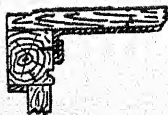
Section of Roof Doorway on TU (Fig. 274).
